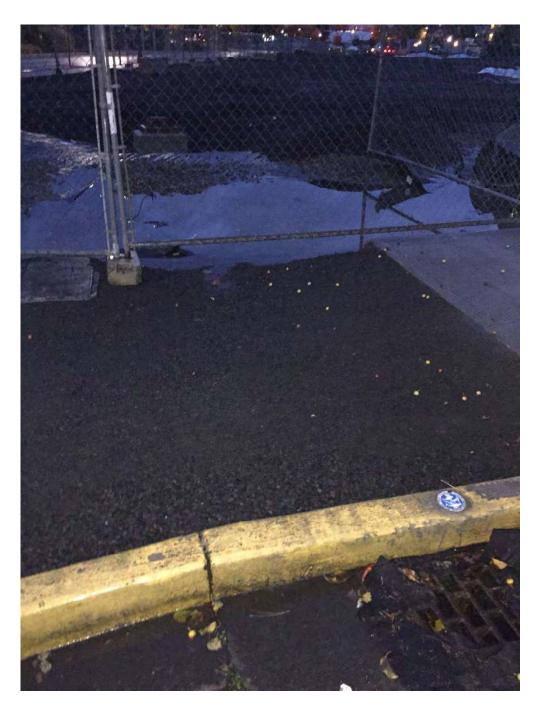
Turbidity Sample Location 2 – Parcel 2/3 – Water inside fence line @ sidewalk Cut on Jefferson Street.
